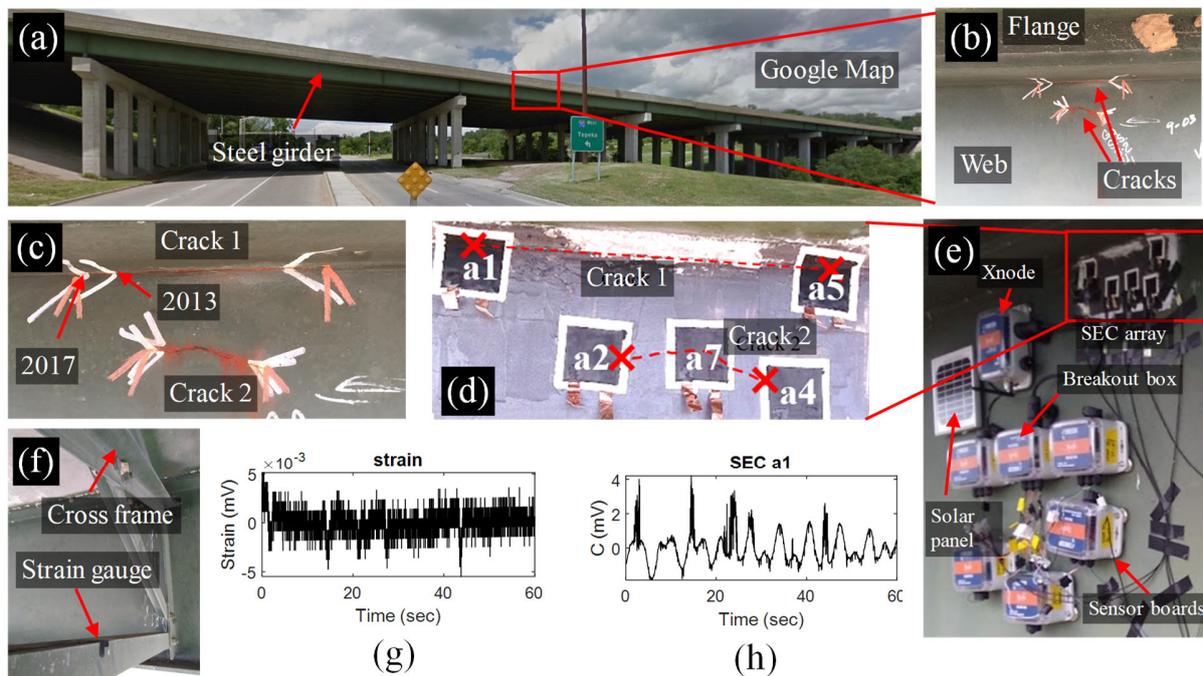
(a) The steel bridge for field deployment; (b) existing fatigue cracks; (c) details of existing cracks; (d) installation of the SEC array; (e) wireless sensor network; (f) strain gauge installation; (g) typical strain measurement under traffic; and (h) typical SEC measurement under traffic.
